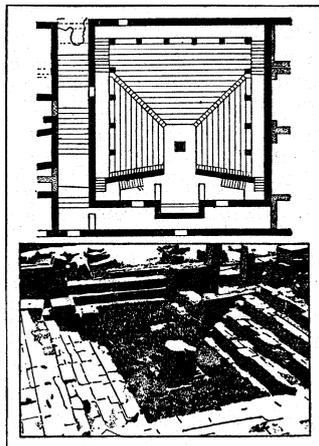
GREEK BOULEUTERION; ABOVE, GENERAL GROUND PLAN; BELOW, PORTION OF RUINS
